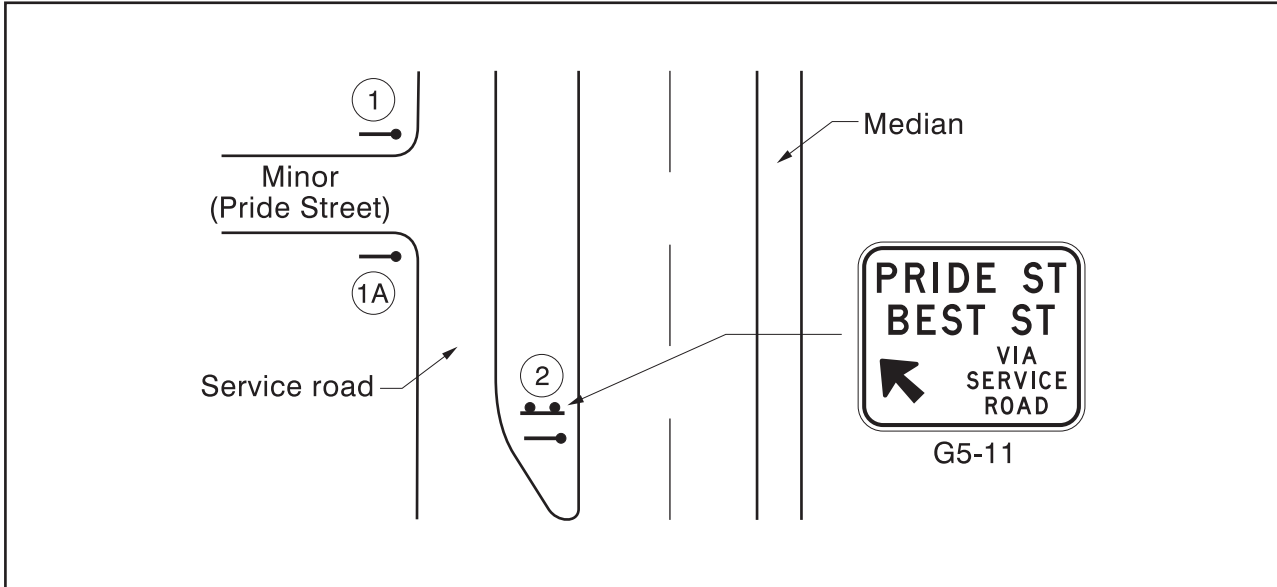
INTERSECTION OF A MINOR STREET WITH A SERVICE ROAD
